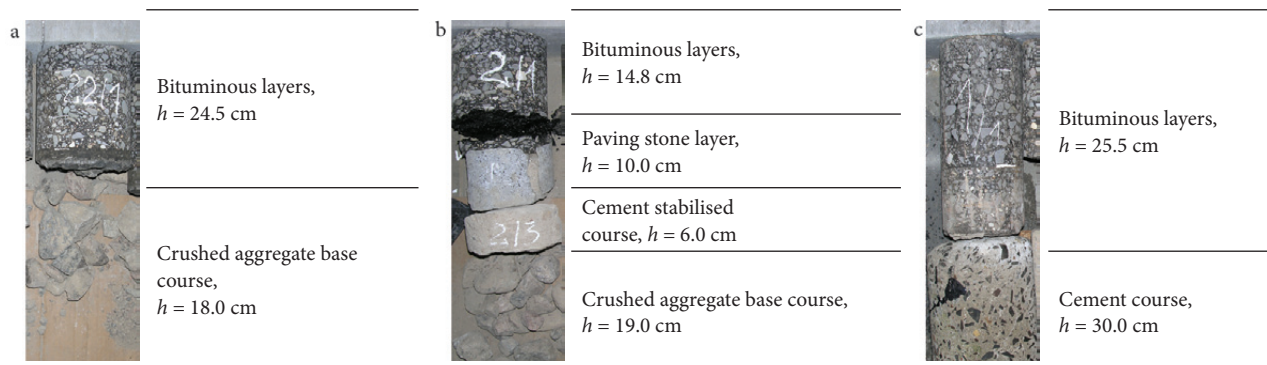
Example specimen of: a – flexible pavement; b – “mixed pavement”; c – semi-flexible pavement
